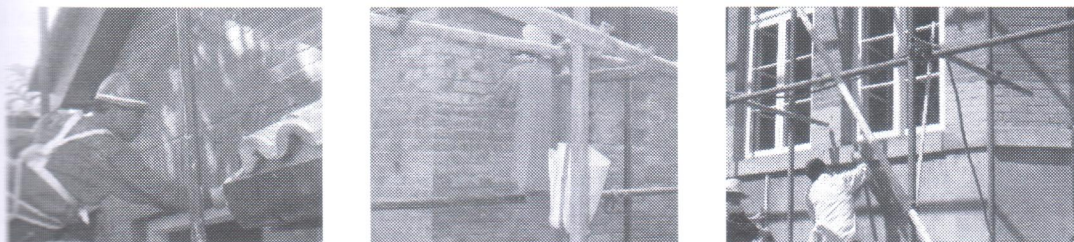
Façade restoration process (paint stripping, brick repairing & repointing)
